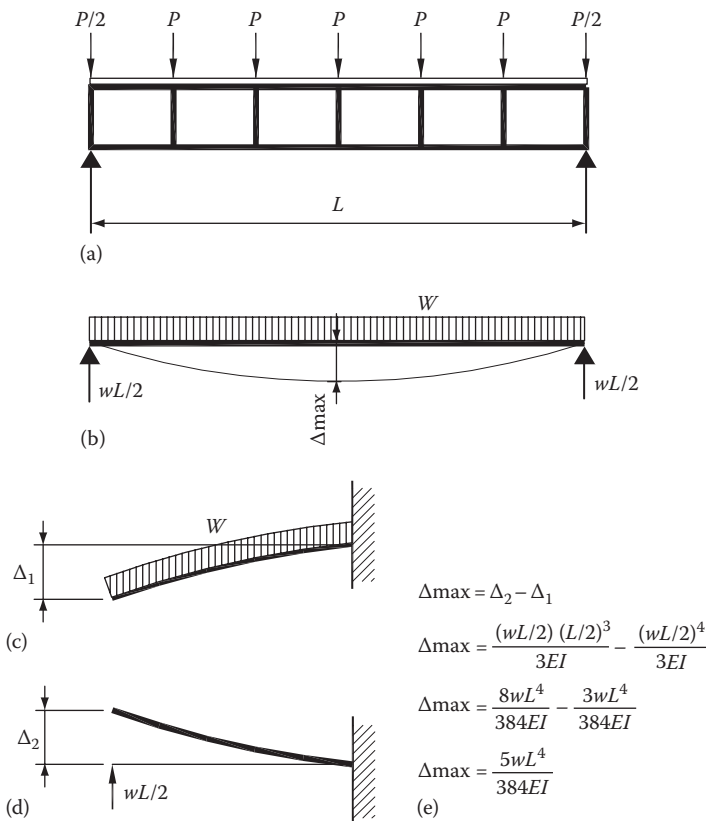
Vierendeel truss preliminary analysis: (a) loads at panel points, (b) equivalent simple beam, (c) tip deflection due to uniformly distributed load, (d) tip deflection due to end reaction, and (e) deflection calculations.
